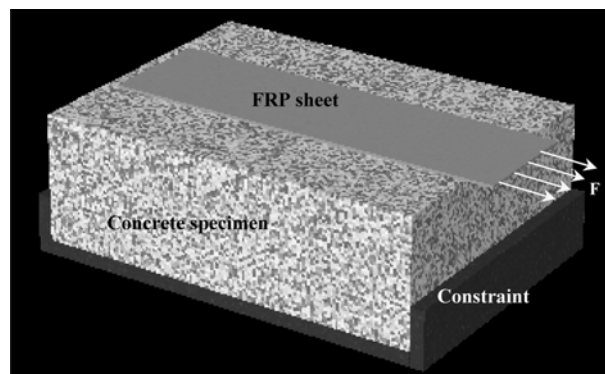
Numerical model for single shear test on FRP sheet bonded to concrete
